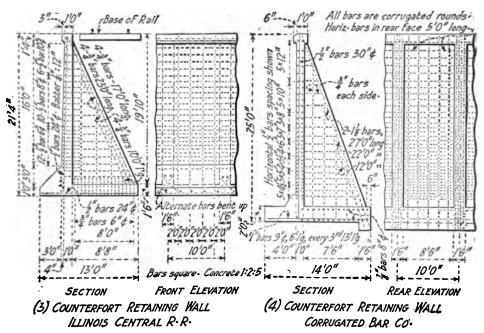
Examples of Reinforced Concrete Retaining Walls.
